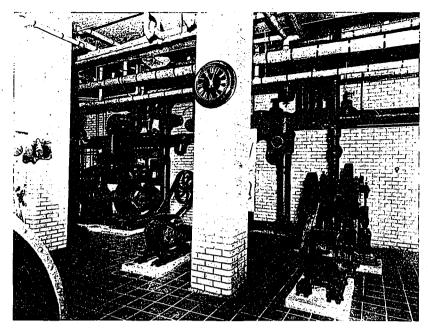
FIGURE VIII. FIRE PUMP AND HOUSE PUMPS.
